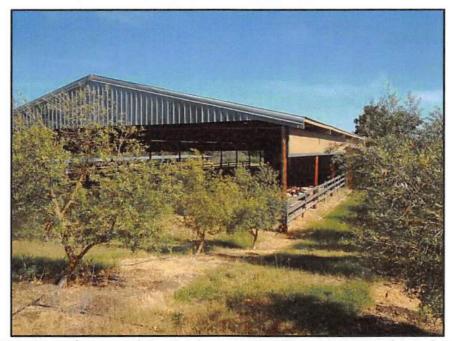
View of proposed Site 1, where existing barn structure to be replaced or retrofitted to support a greenhouse for indoor cannabis cultivation, view east. (May 10, 2018).
